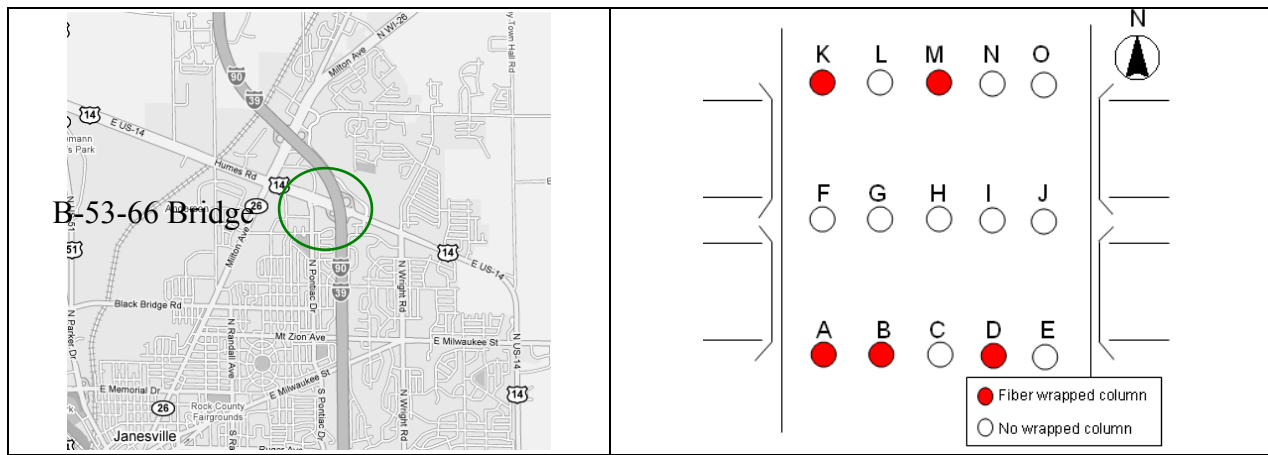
Location of B-53-66 bridge in Rock Co., WI and arrangement of columns (map: after Google Maps 2008).
